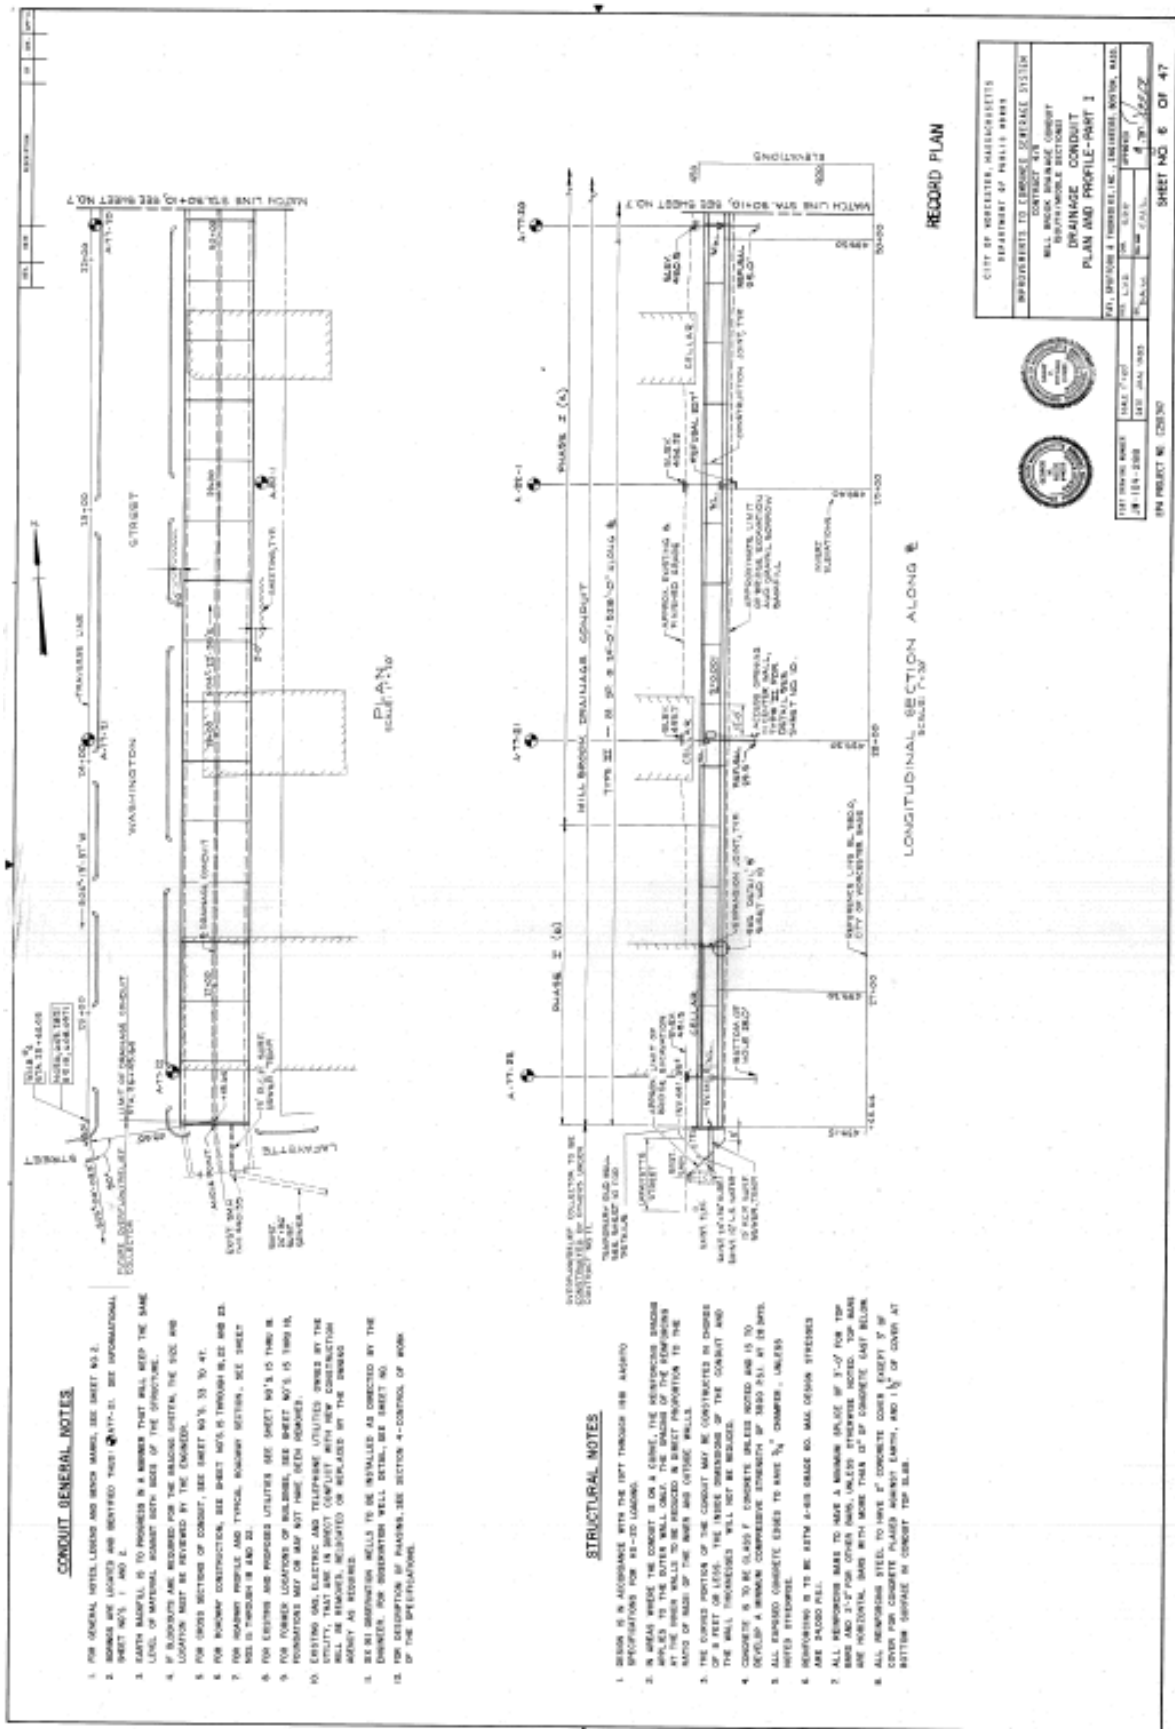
Improvements to Combined Sewerage System Contract No. 4-5 - Drainage Conduit Plan and Profile Part I
